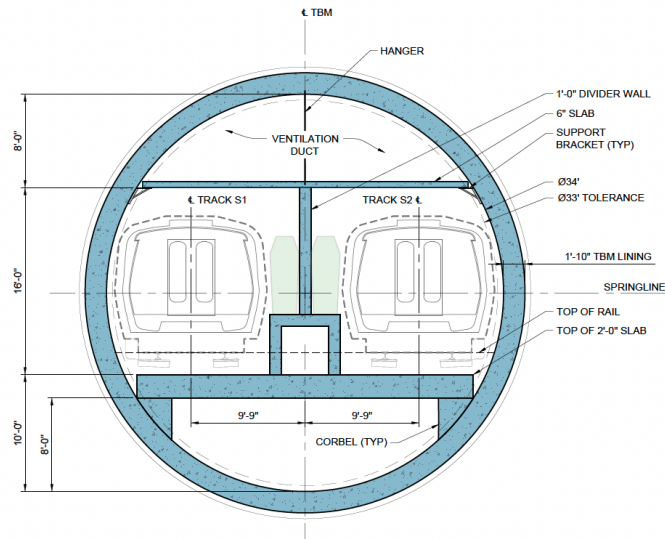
Single-Bore Twin Track Mid-Size Tunnel
